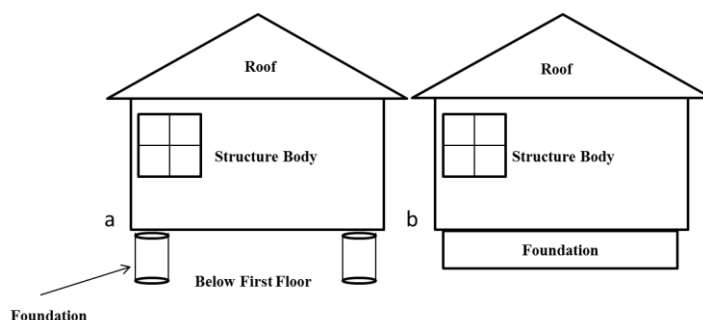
Typical Single Family Dwelling Subassemblies for a) Pile Structures and b) Slab or Pier Structures
